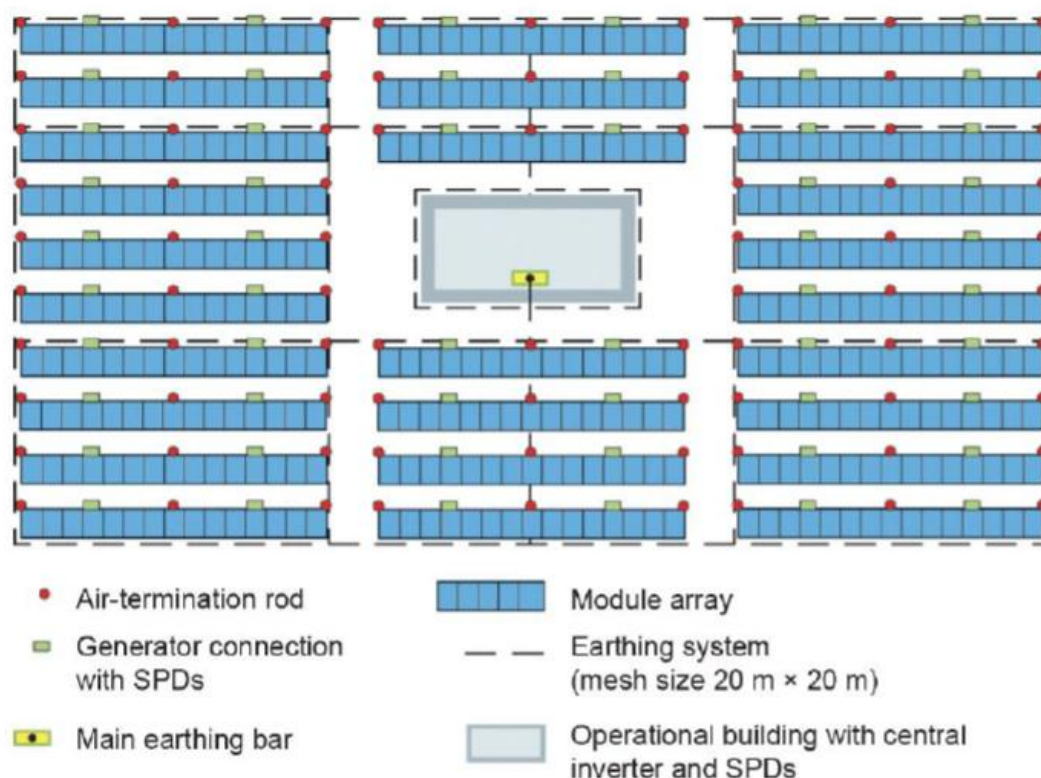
TYPICAL ARRANGEMENT OF EARTHING AND SURGE PROTECTION DEVICES IN SOLAR PV INSTALLATION
